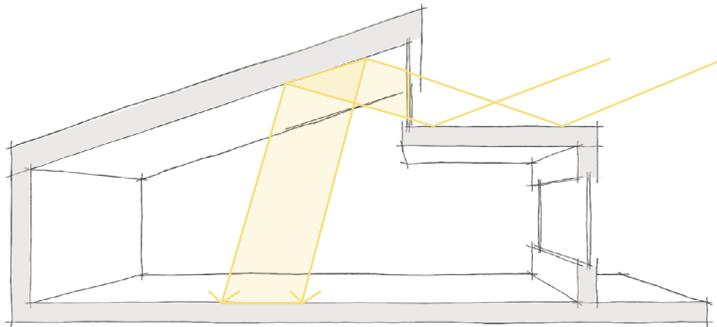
A skylight is an example of how to bring natural light into typically darker areas of a building.
